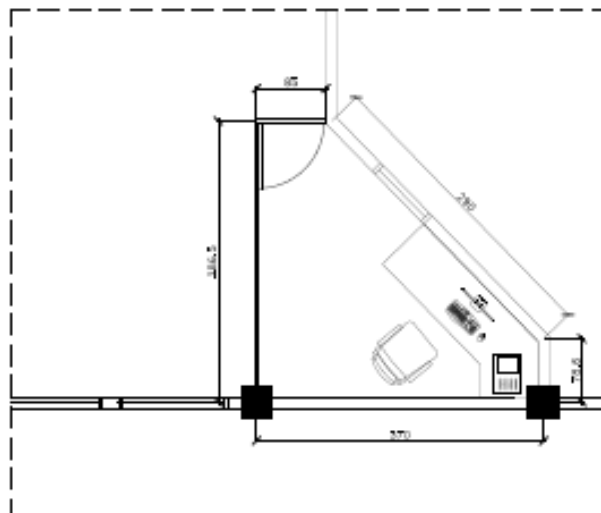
2D Sketch for the Multimedia Room on the Second Floor of HKBP Church Building
